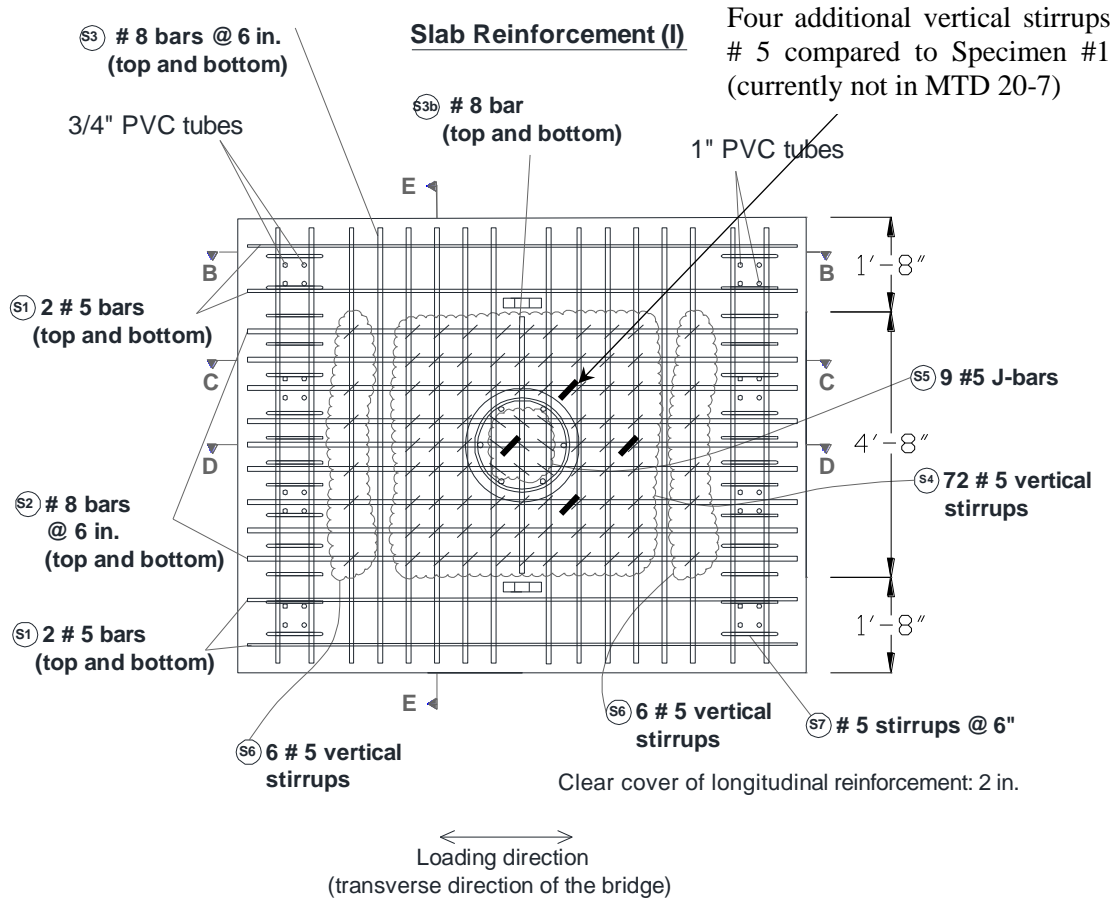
Plan view of slab reinforcement for Specimen #2
